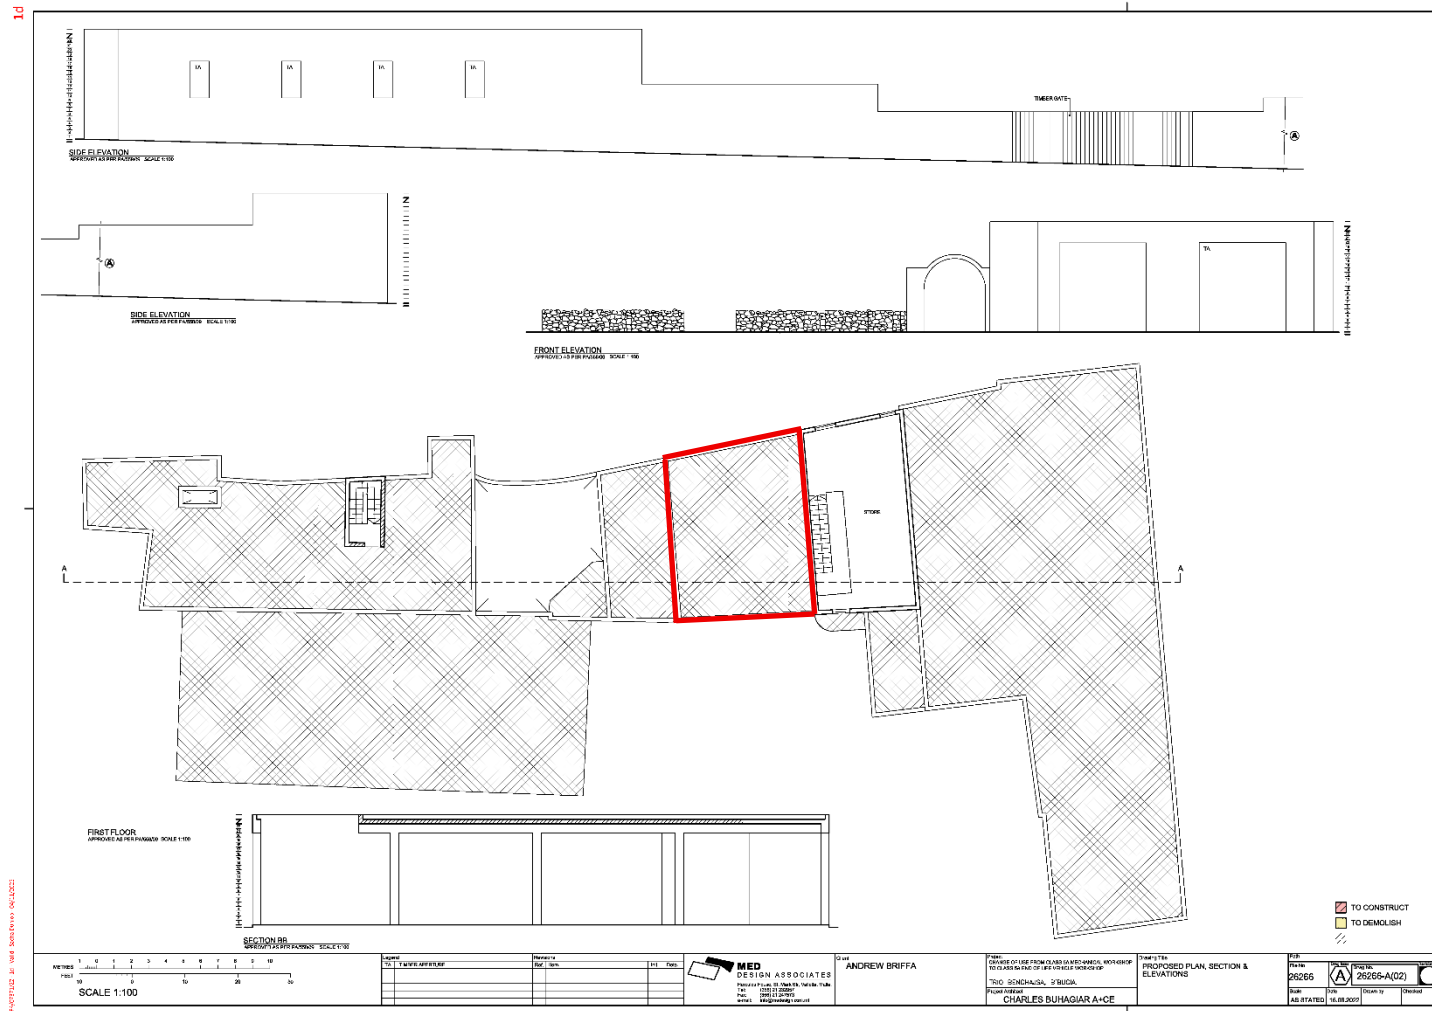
ELEVATIONS AND SECTIONS OF PROPOSED SCHEME AND SURROUNDINGS. PROPOSED SCHEME MARKED WITH RED OUTLINE.
